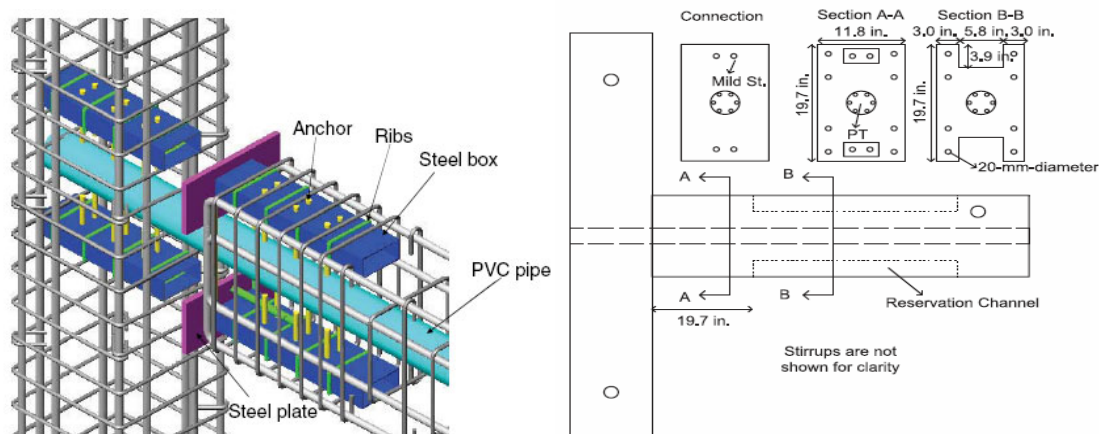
Details of the connection details (left) and post-tensioned specimens (right) proposed in Turkey. [2.37]
